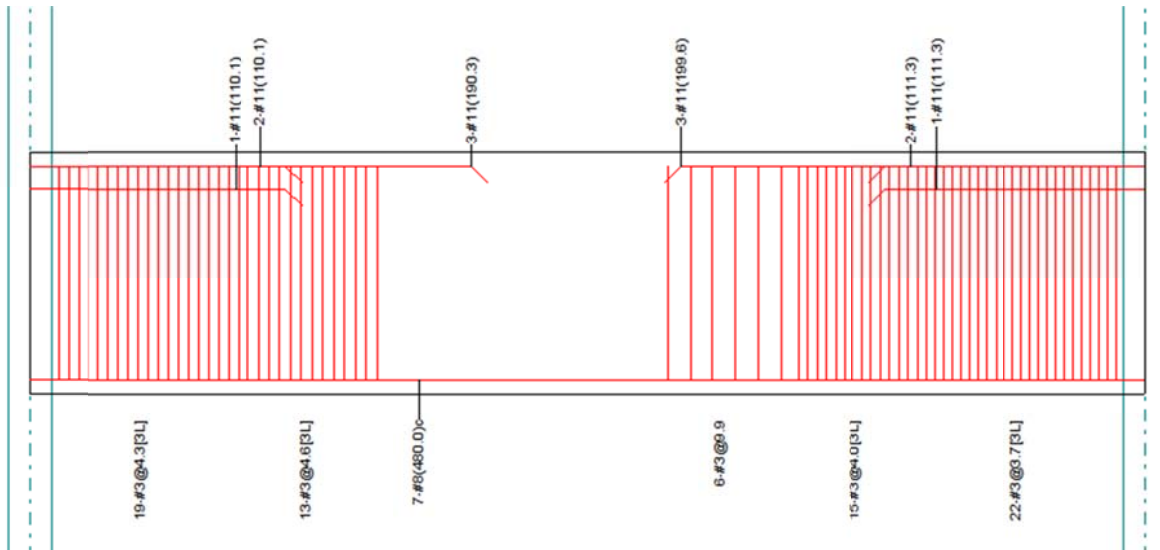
spBeam Transfer Girder 1 Reinforcing Diagram (Lateral Loads)
